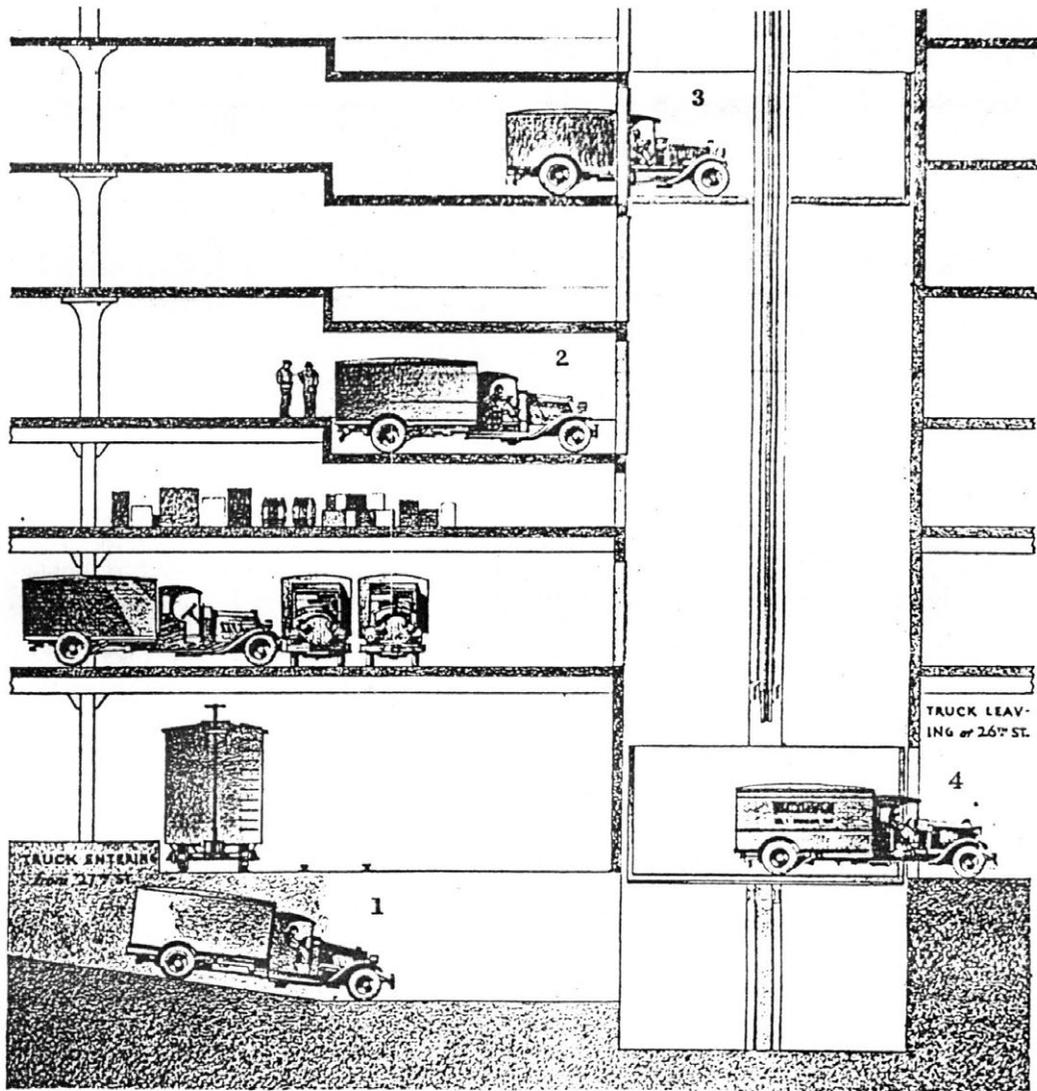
Section of the Starrett-Lehigh building, New York. 1930.
